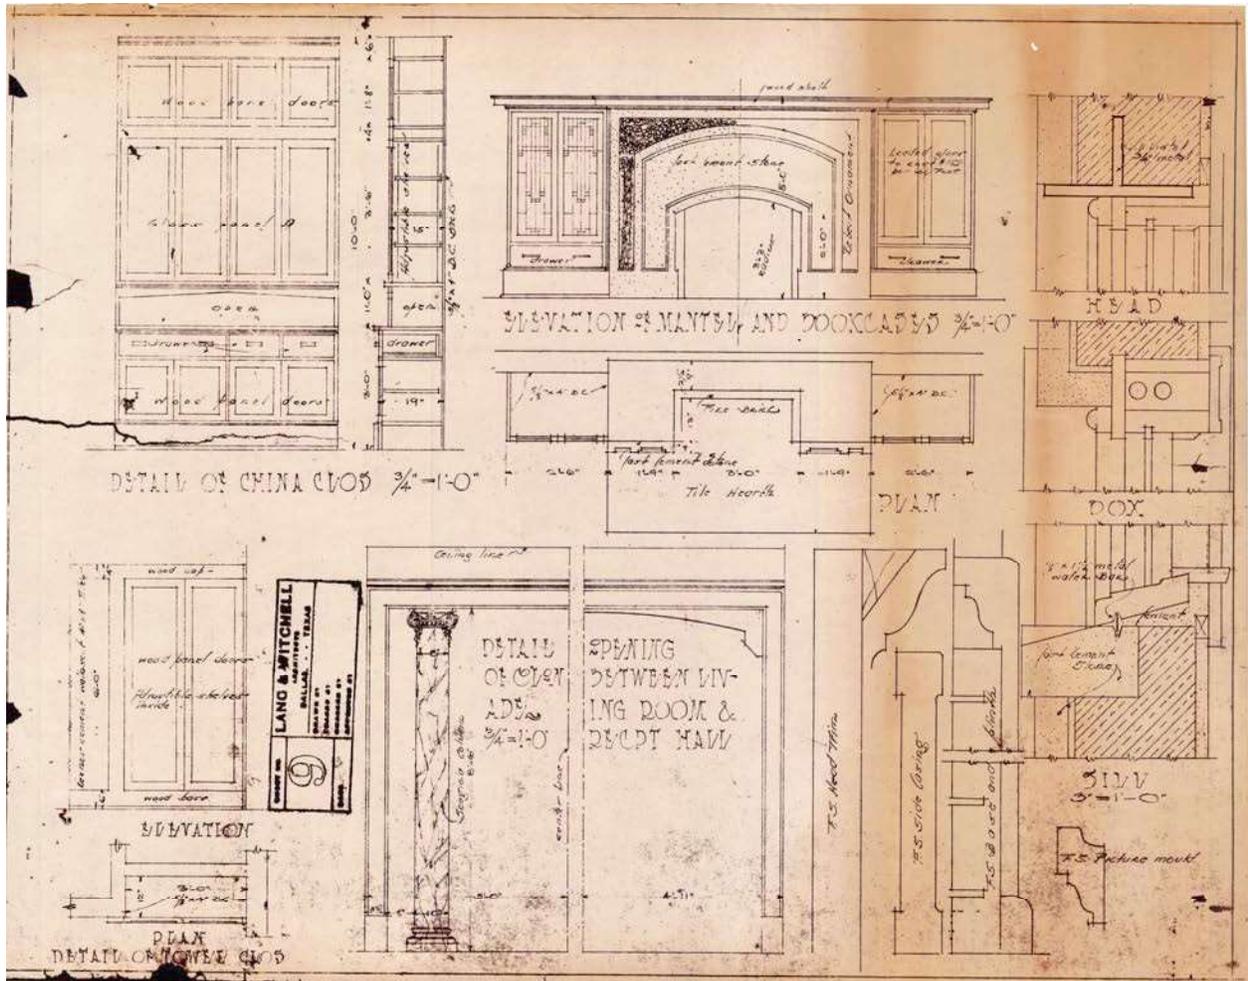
Original Lang and Witchell Interior Details – Unnumbered. Sheet 9 of 9
